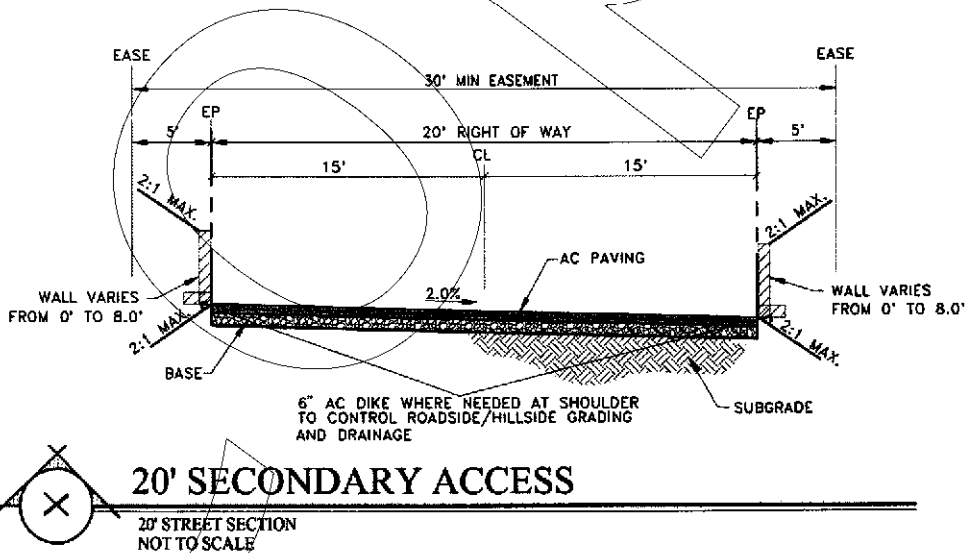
B – Permanent Secondary (Emergency) Access Street Sections
